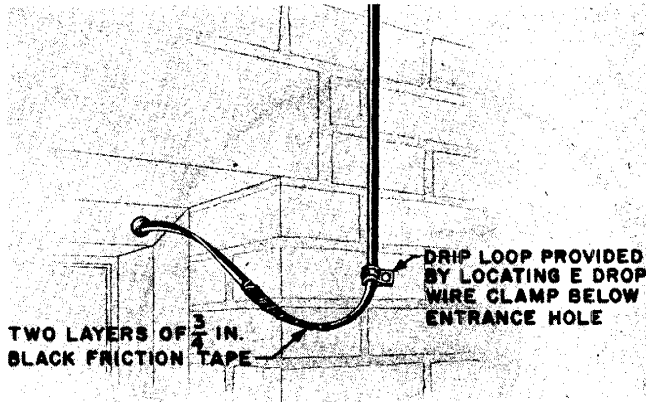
Last Attachment, Building Entrance Hole Does Not Slope Upward from Outside
